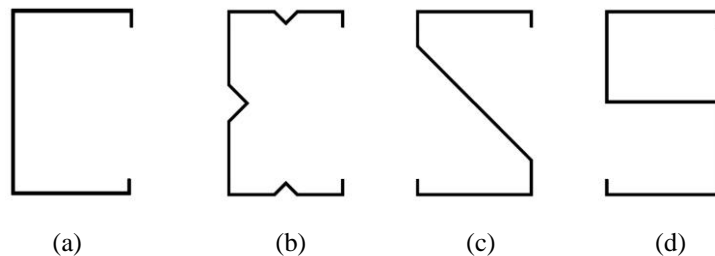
Cold-formed cross-section shapes: (a) plane lipped channel – PLC, (b) stiffened lipped channel (SLC), (c) S-section with sloped web (S45) and (d) S-section with straight web (S90)
